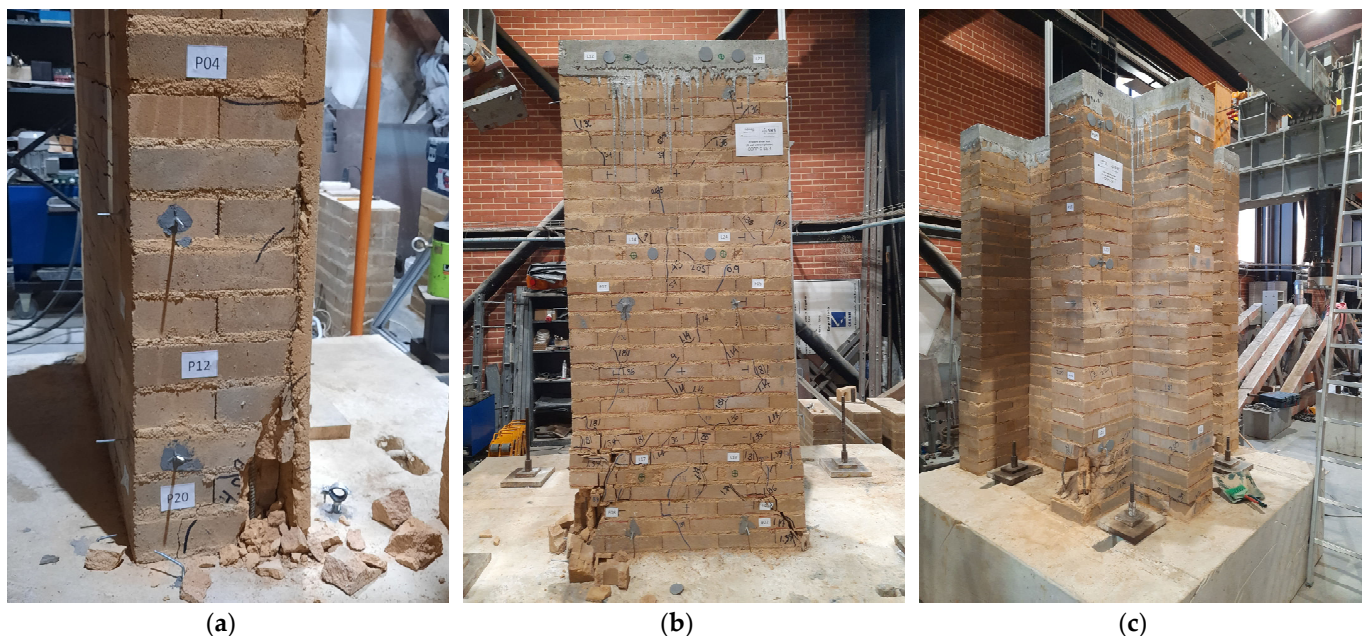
(a) C-panel damaged after out-of-plane bending shear testing. (b) C-panel specimen after in-plane bending shear testing. (c) L-panel damaged after in-plane bending shear testing.
